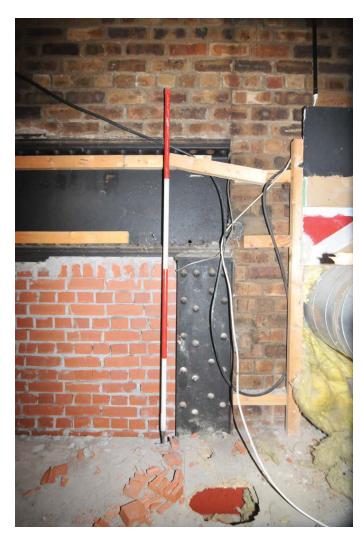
Detail of Bressummer Beam and brickwork phasing, interior west-facing elevation, Cinema 5
